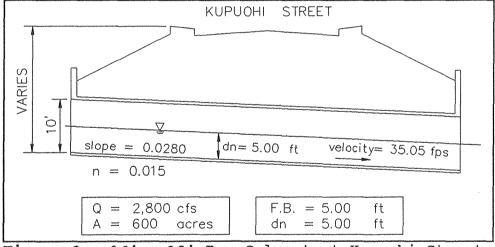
16' x 10' Box Culvert at Kupuohi Street.
